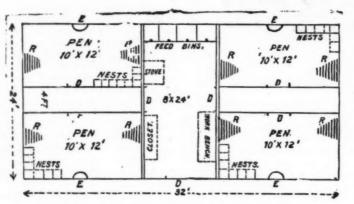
PLAN OF FRONT PERSPECTIVE. 2. GROUND PLAN.
